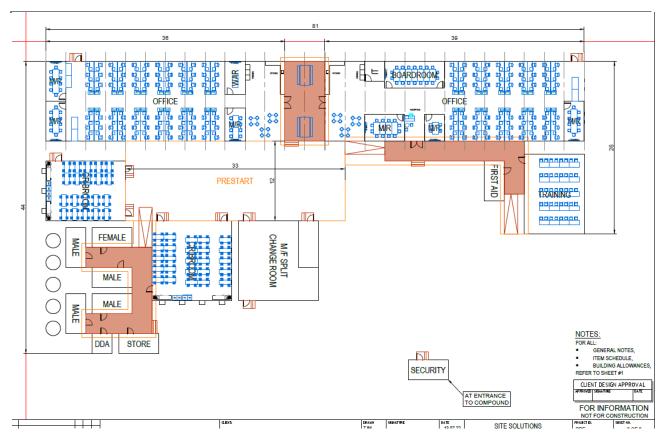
Proposed Office Layout (Corner of Green and Tudor Rd).
